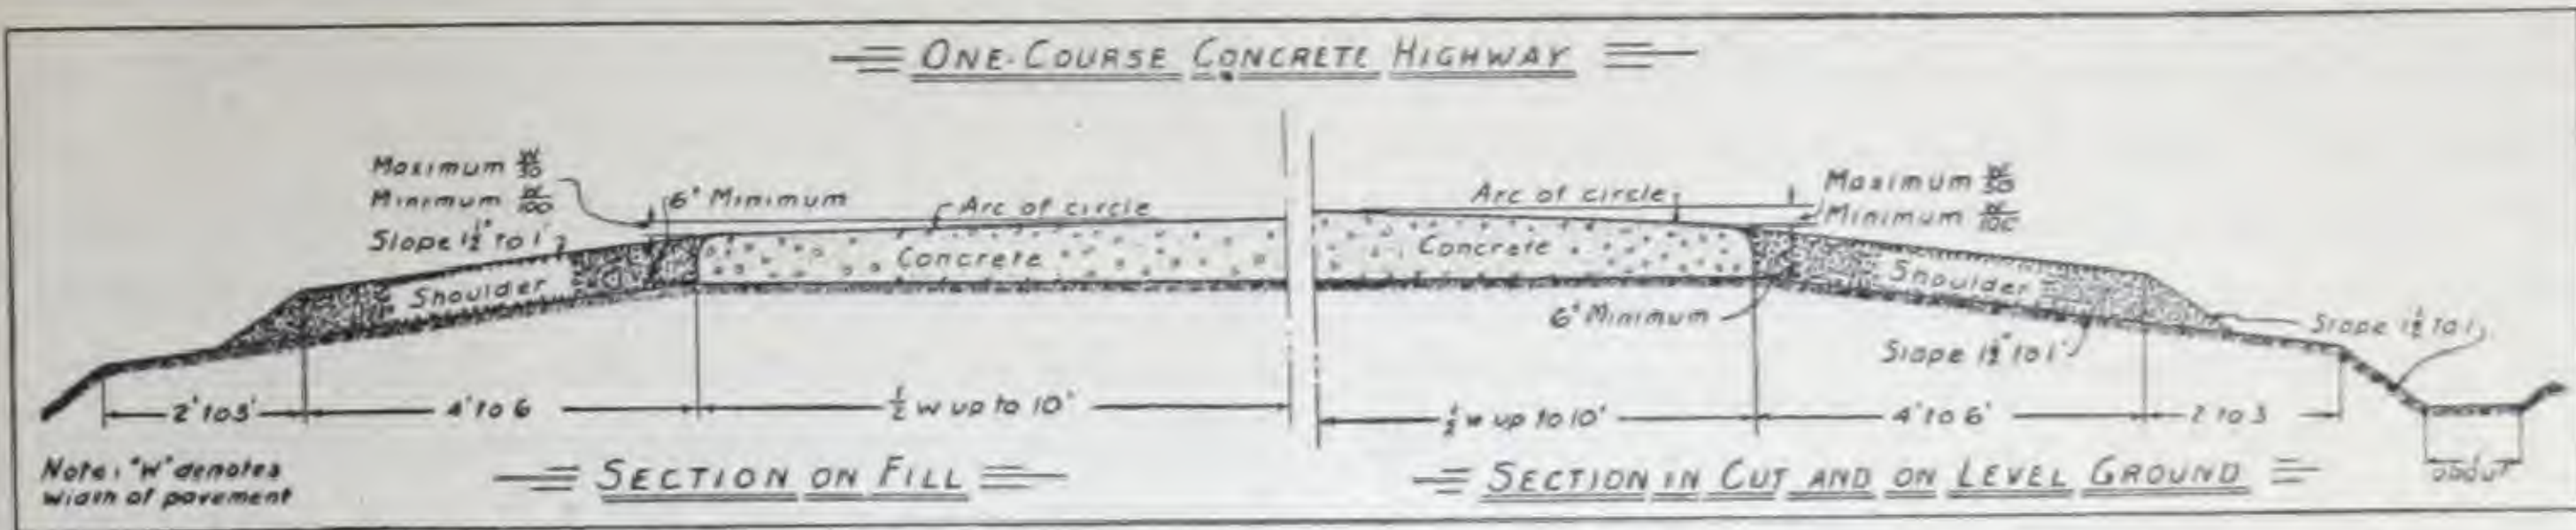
Details for building one-course concrete highway, showing how the road should be arched or crowned to secure a proper surface, and how the shoulder and gutter should be built.
